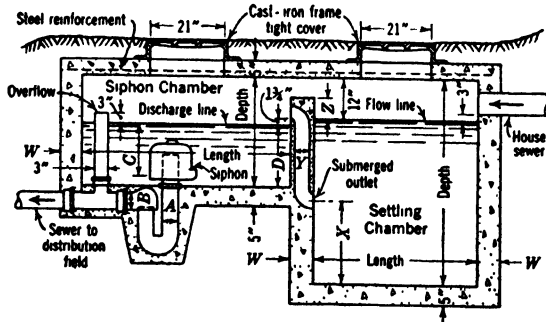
Typical Two-Chamber Concrete Septic Tank. (From U. S. Department of Agriculture, Farmers' Bull. 1227.)
